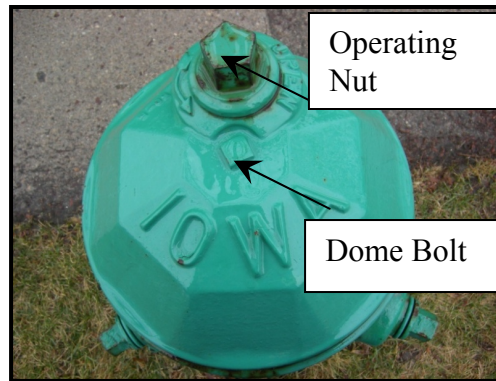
Top of the Iowa valve fire hydrant in Ames, Iowa with dome bolt
